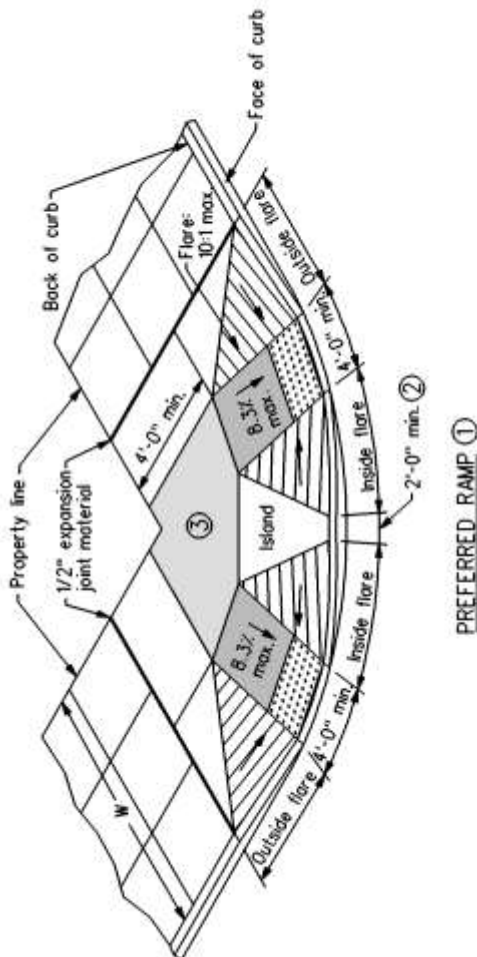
CURB RAMP WITHIN INTERSECTION
